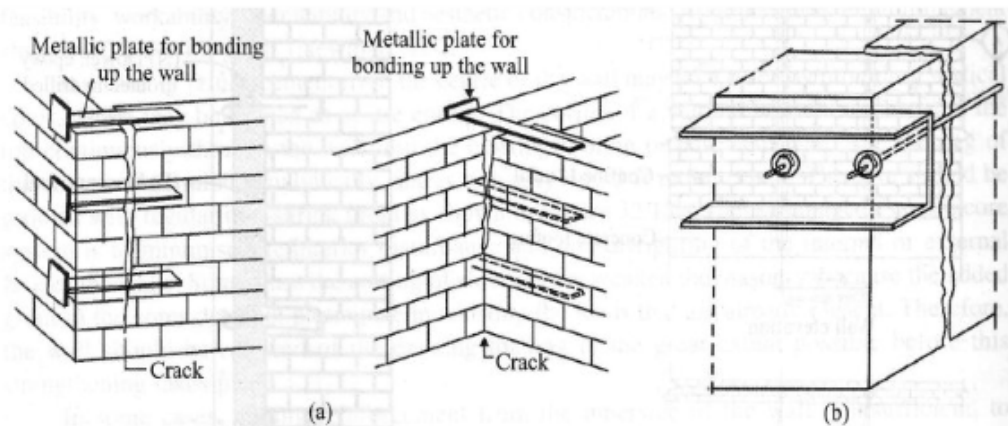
Strengthening of separated wall intersection (a) Use of steel plates (b) Use of tie rod (UNDP, 1983).
